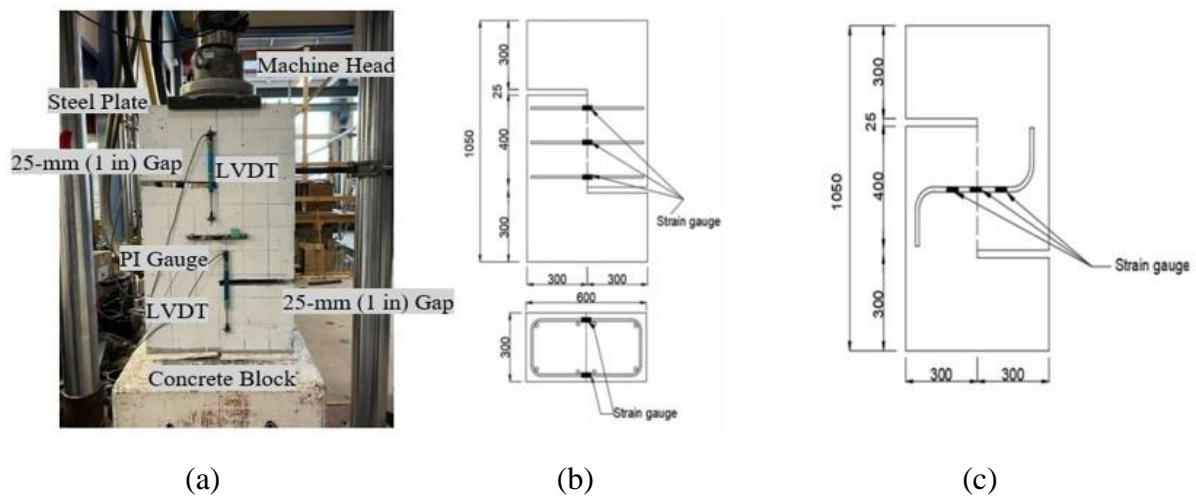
(a) Test set up and instrumentation, (b) strain gauge arrangement for closed stirrups, and (c) strain gauge arrangement for closed stirrups.
